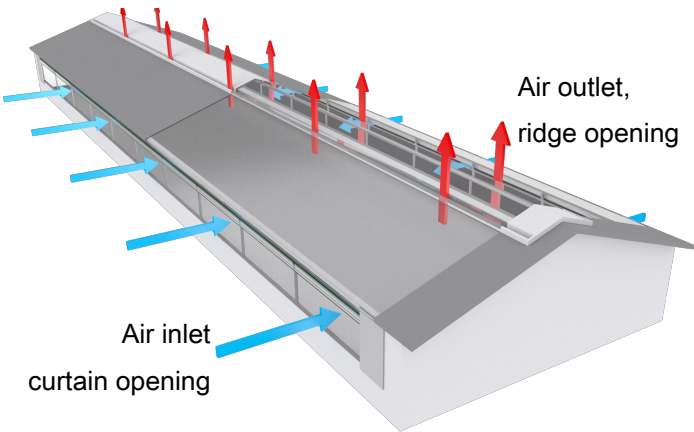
For example, on a house with pure natural ventilation with curtain openings on the sides of the house and ridge opening in the roof.
